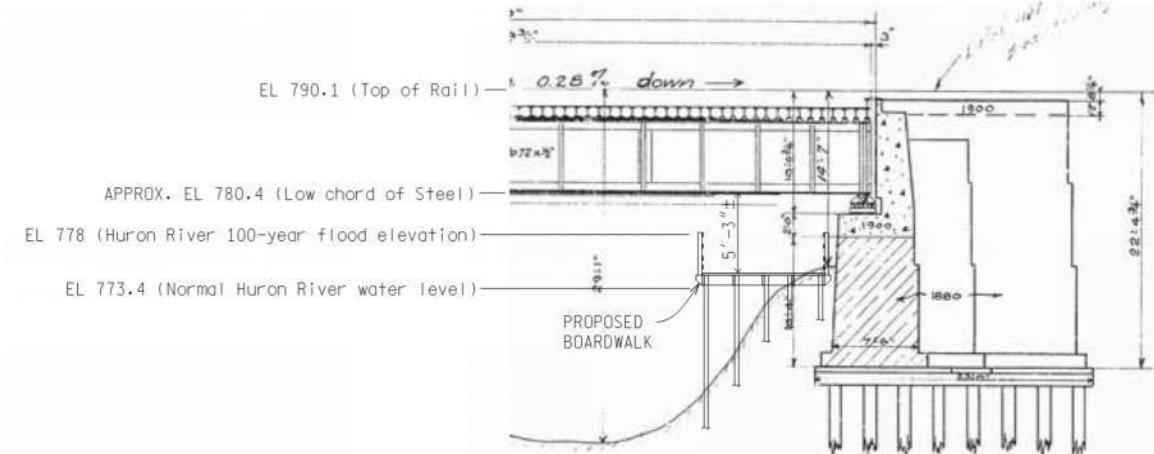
Existing Railroad Bridge over Huron River Elevation
